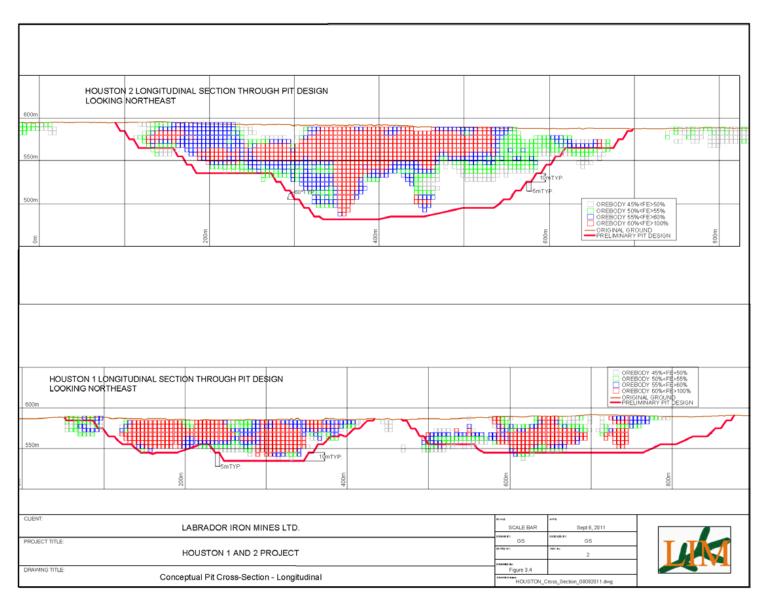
Conceptual Pit Cross-Section – Longitudinal
